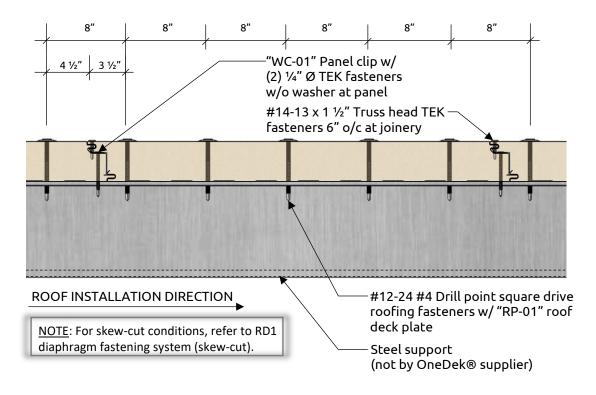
RD1 Diaphragm fastening system (40/7-6) (Section view)
